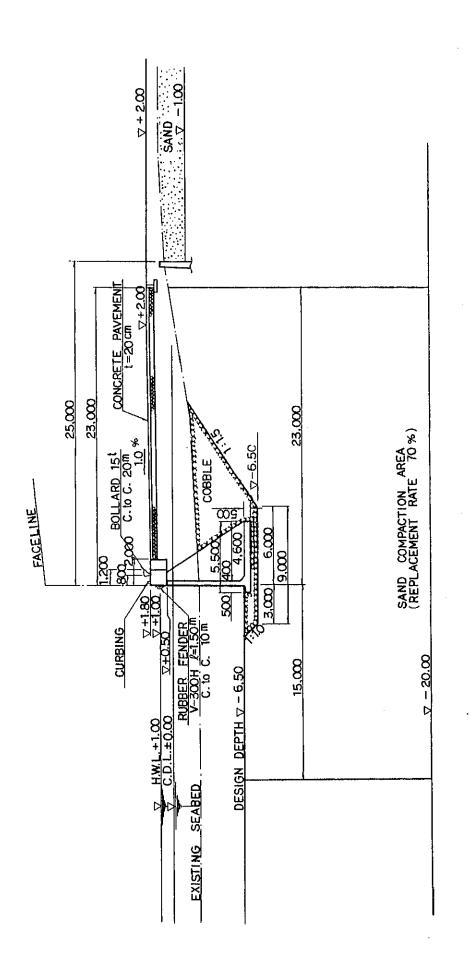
Design of Type-B (L-shaped Concrete Block)
